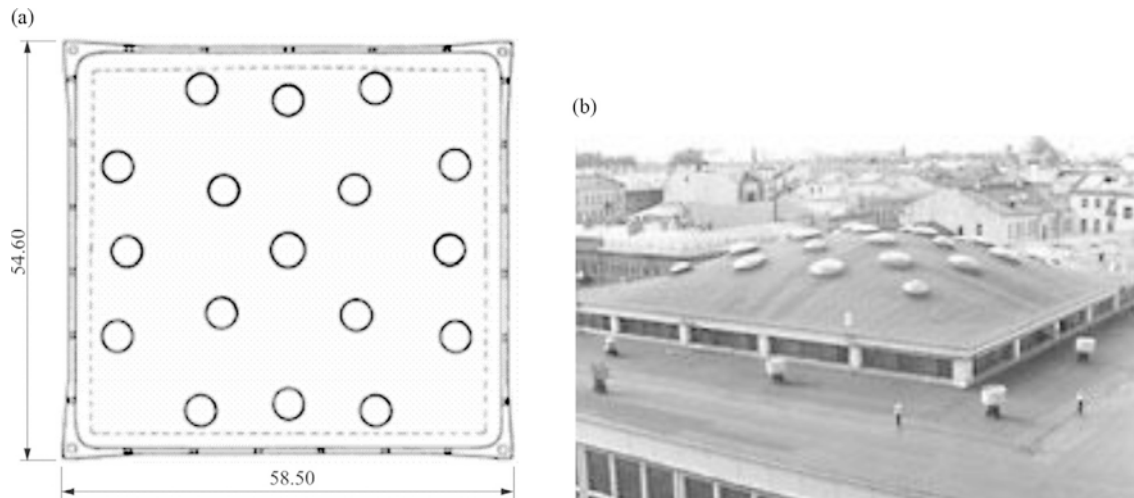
The largest bubble shells of Heinz Isler: (a) the shell plan with 17 circular roof lights [10], (b) reinforced concrete dome under Nekrasov (Maltzev) Market in St. Petersburg [23].
